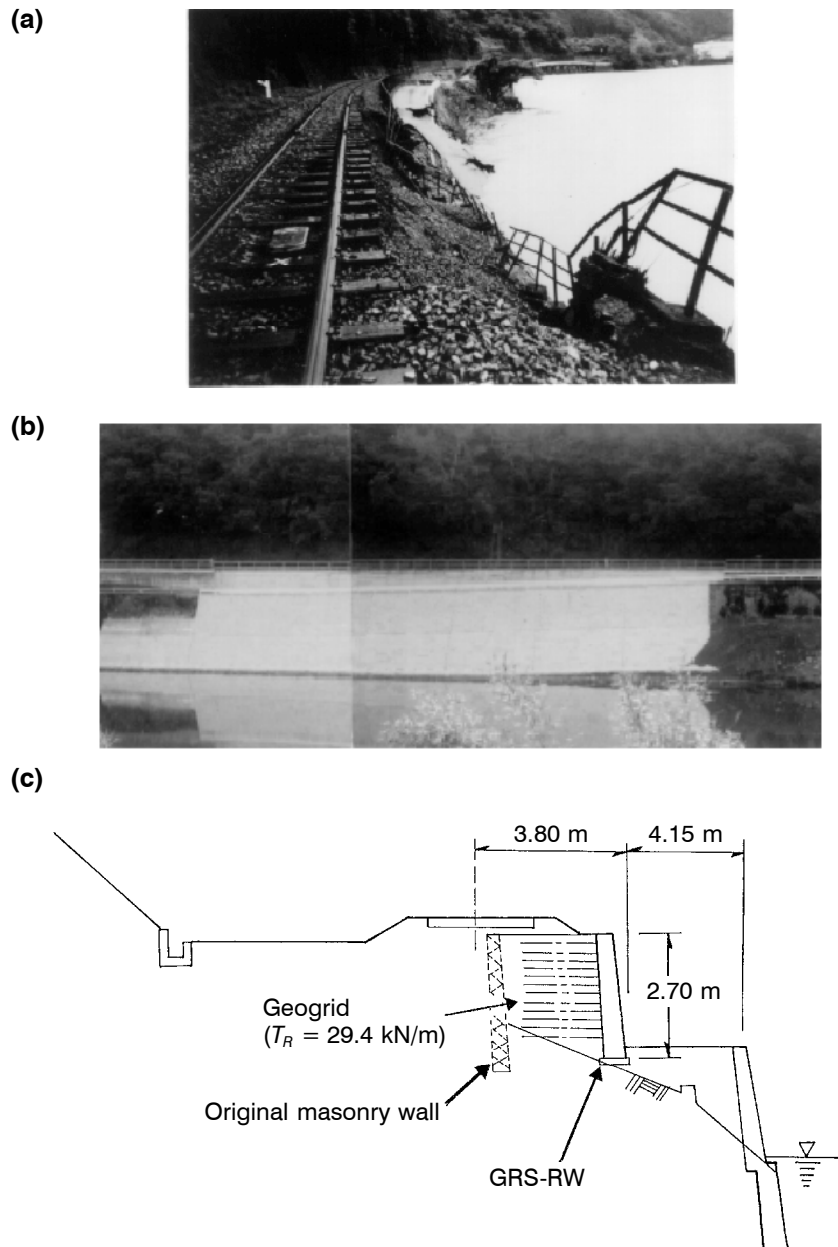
Railway embankment damage and reconstruction in 1993 at Hyo-kiyama/Hinatayama site, the Hisatsu Line (Location 35, Figure 3): (a) damaged embankment; (b) reconstructed embankment; (c) typical cross section of a reconstructed embankment.
